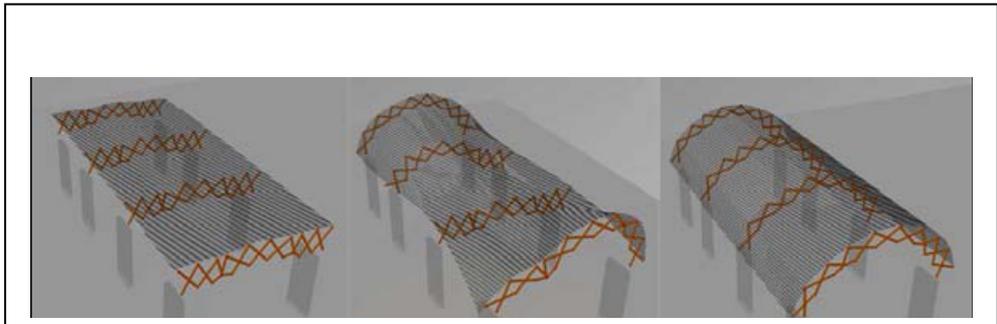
Use of proposed scissor structures as parallel beams(Akgün, et al. 2007).
